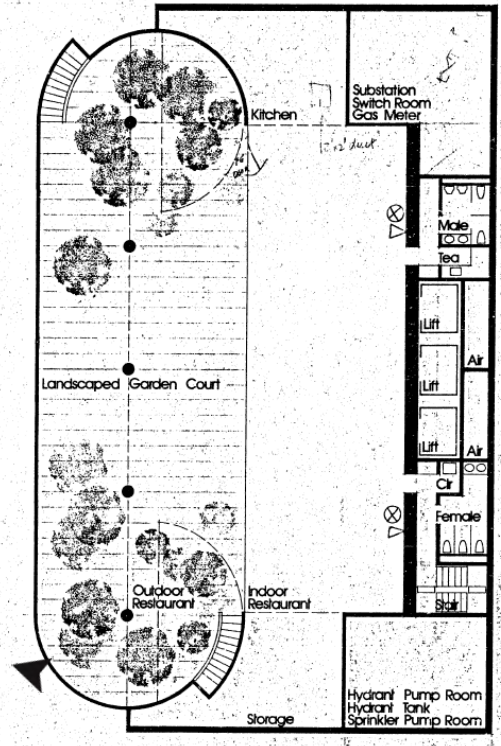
Basement floor plan, stamp dated 1974 (BAP).
